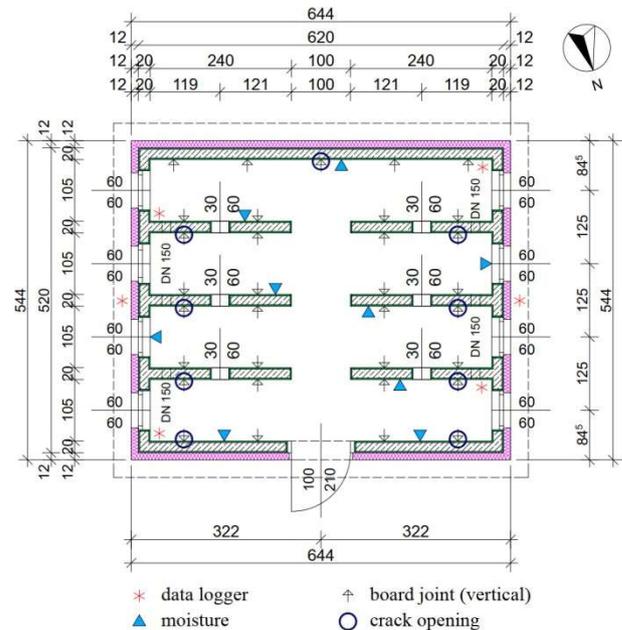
Ground plan of the building (dimensions in cm) with north arrow and position of the monitoring points.
